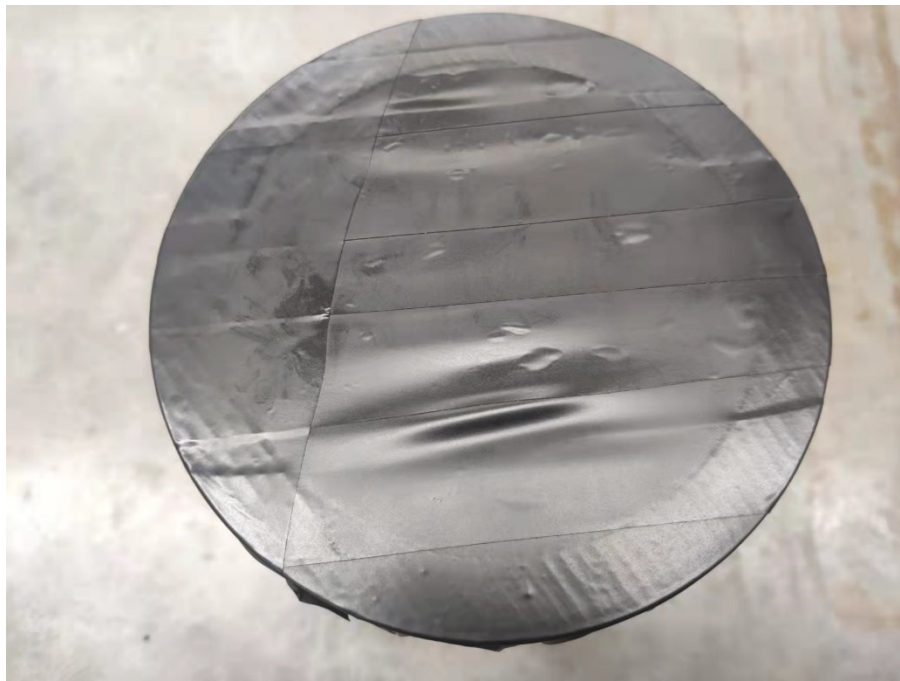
Sealing of bottom surface for the outer casing of the cement removal test sample
